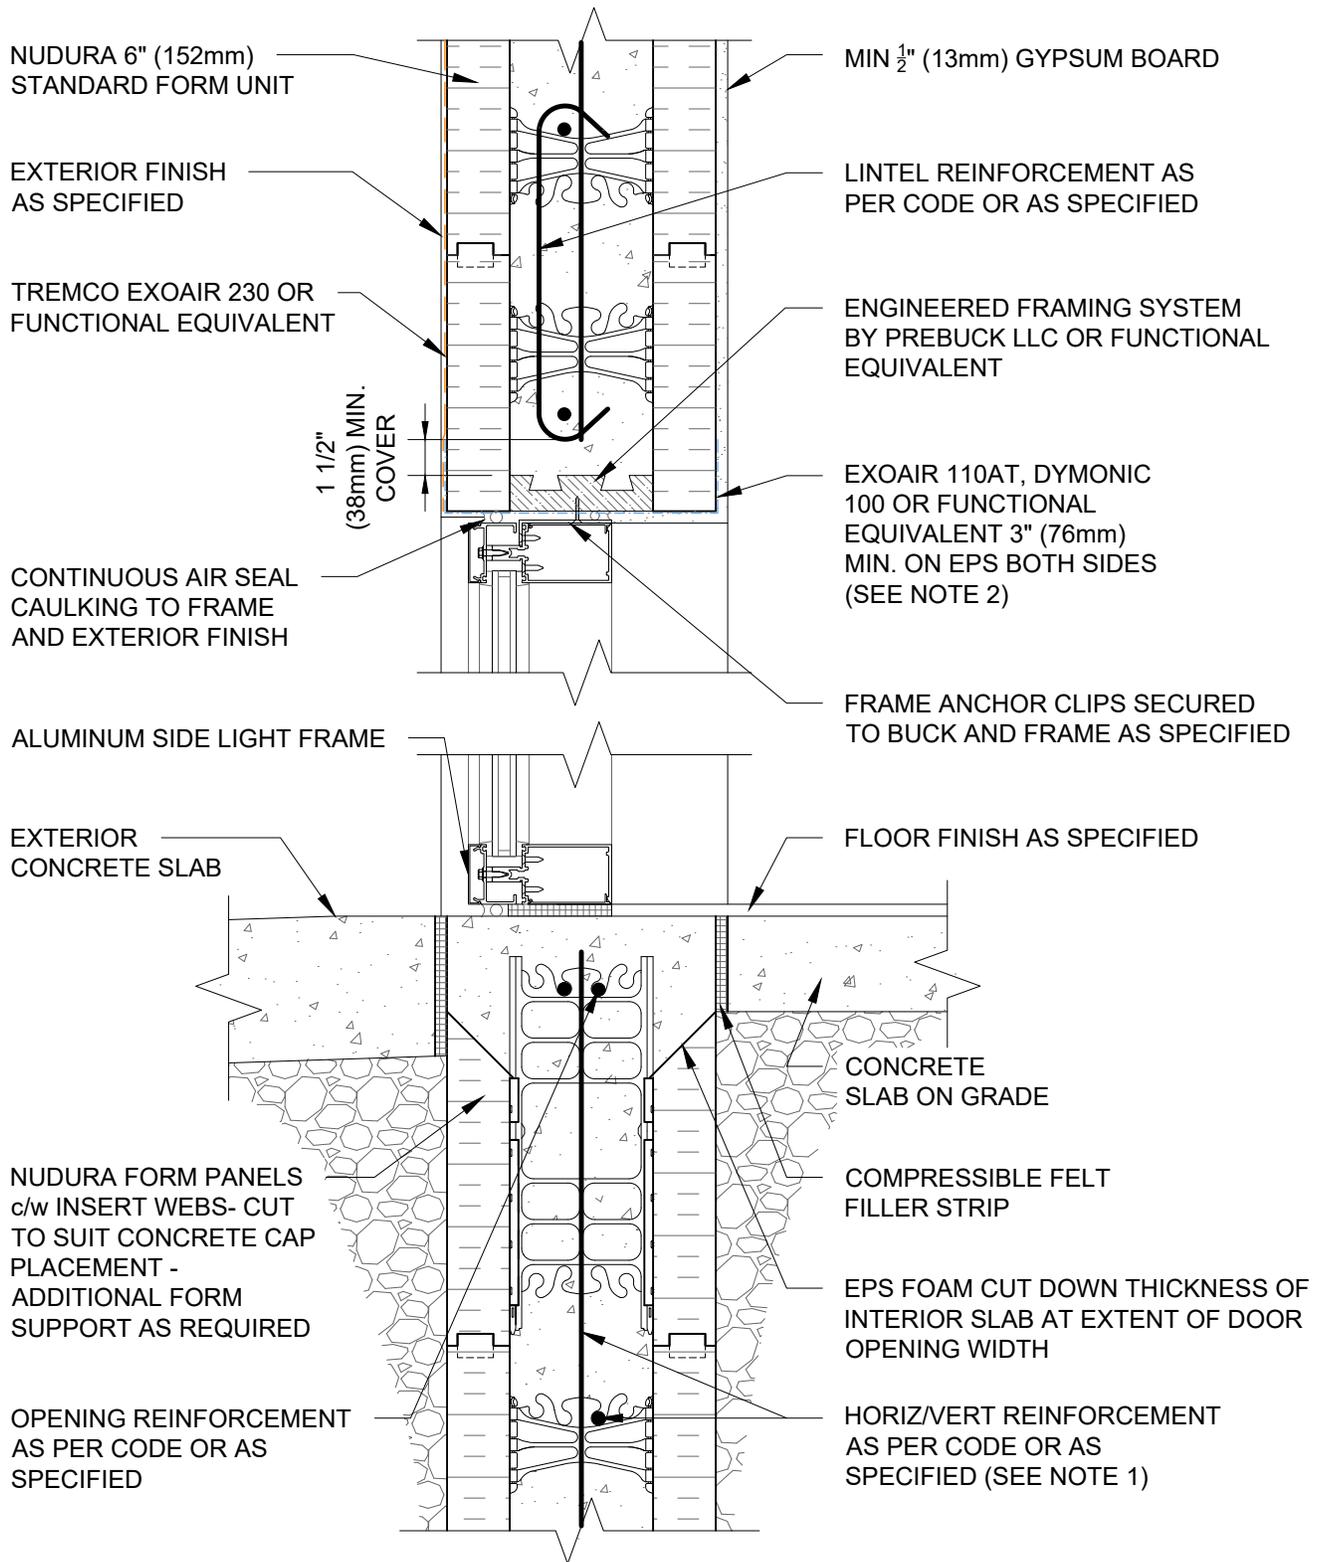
" (152mm) Form Unit, Concrete Mounted Aluminum Door Jamb, Exterior Finish as Specified
